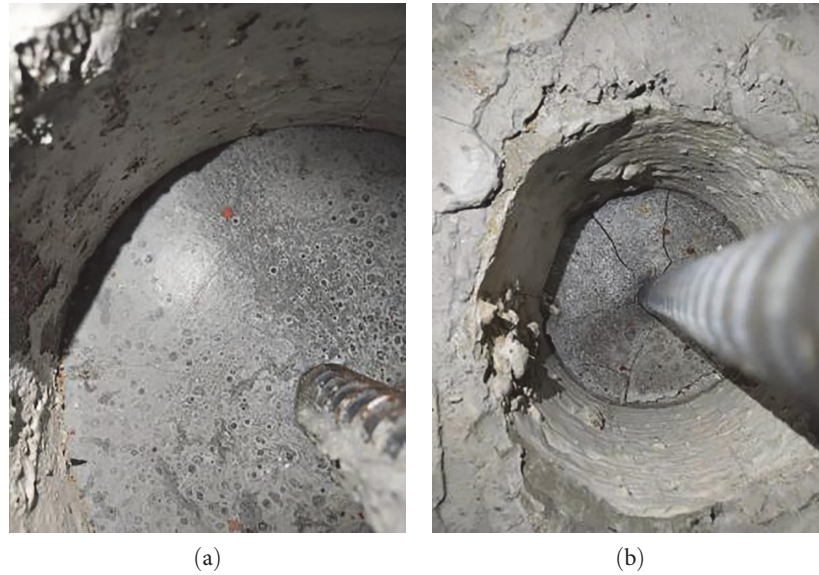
Failure modes of the specimens. (a) Pull out and (b) circumferential crack.
